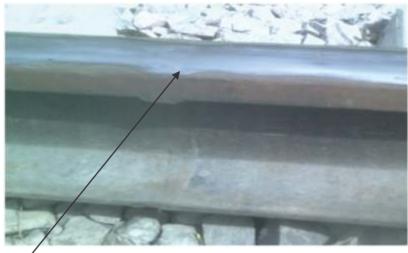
(a) Tolerances for vertical misalignment of welded joint with new rails
